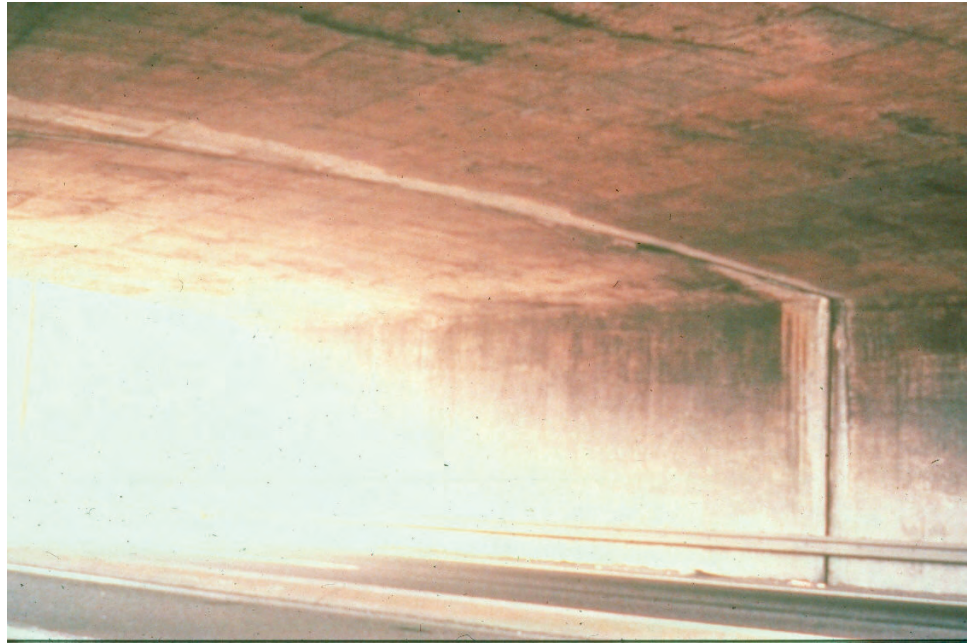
Longitudinal Joint Between Slab Beam Frames
